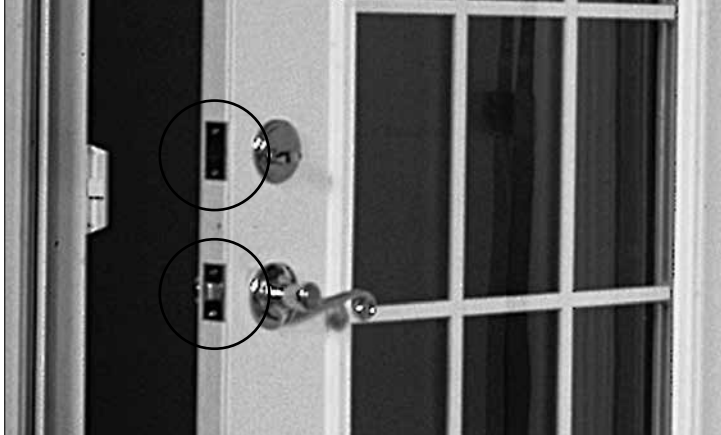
The latch and dead bolt are installed per the hardware manufacturer installation detail.
